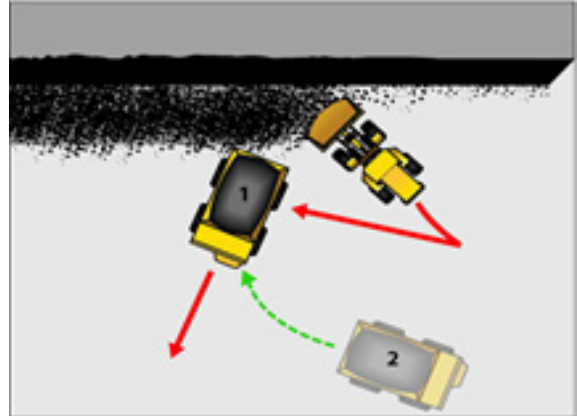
Wheel loader's paralel dig layout (Anon. b, 2016)
